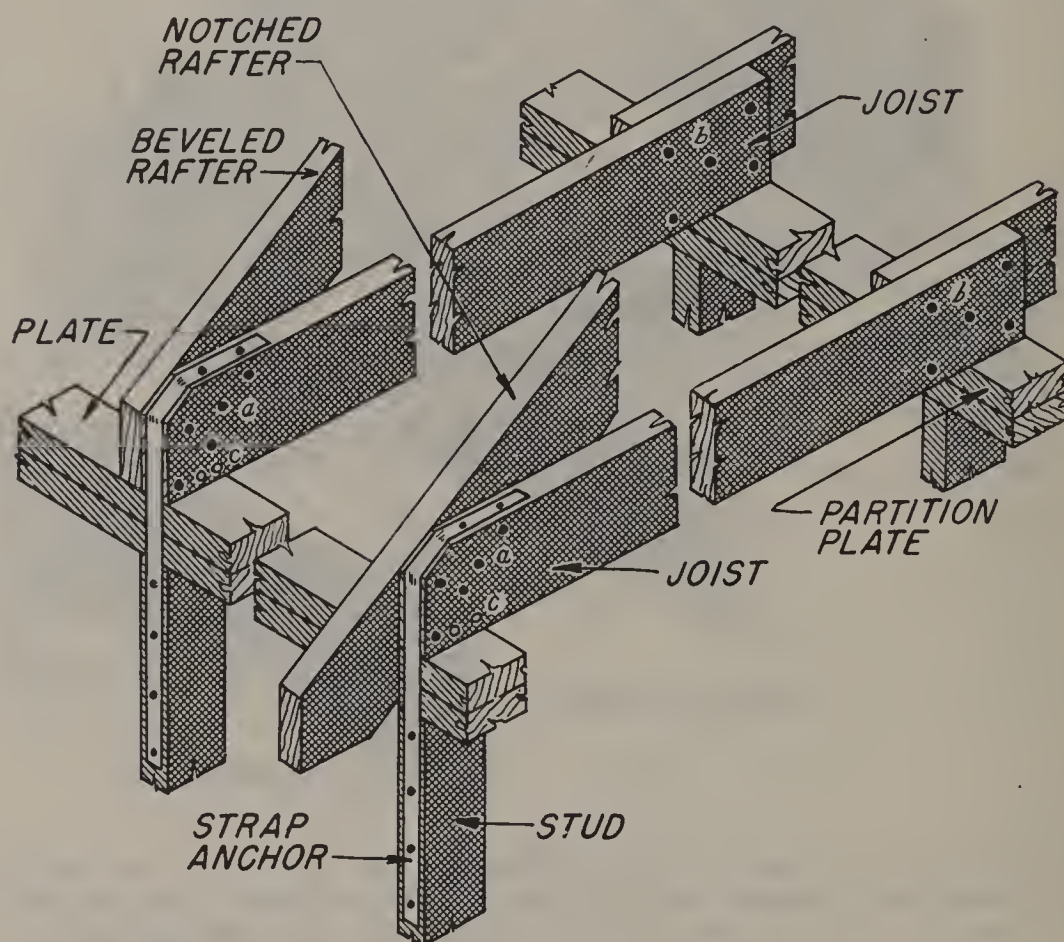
Rafters (beveled or notched) and ceiling joist resting on wall plate. *a*, Five tenpenny nails through joist into rafter (or through rafter into joist). *b*, Overlap of joists at bearing partition nailed with five tenpenny nails. *c*, Joist and rafter toenailed to plate with four tenpenny nails, two on each side of assembly. Additional security against uplift is afforded by metal straps placed as shown and nailed with four eightpenny nails to studs and with two eightpenny nails to upper edges of joist.
